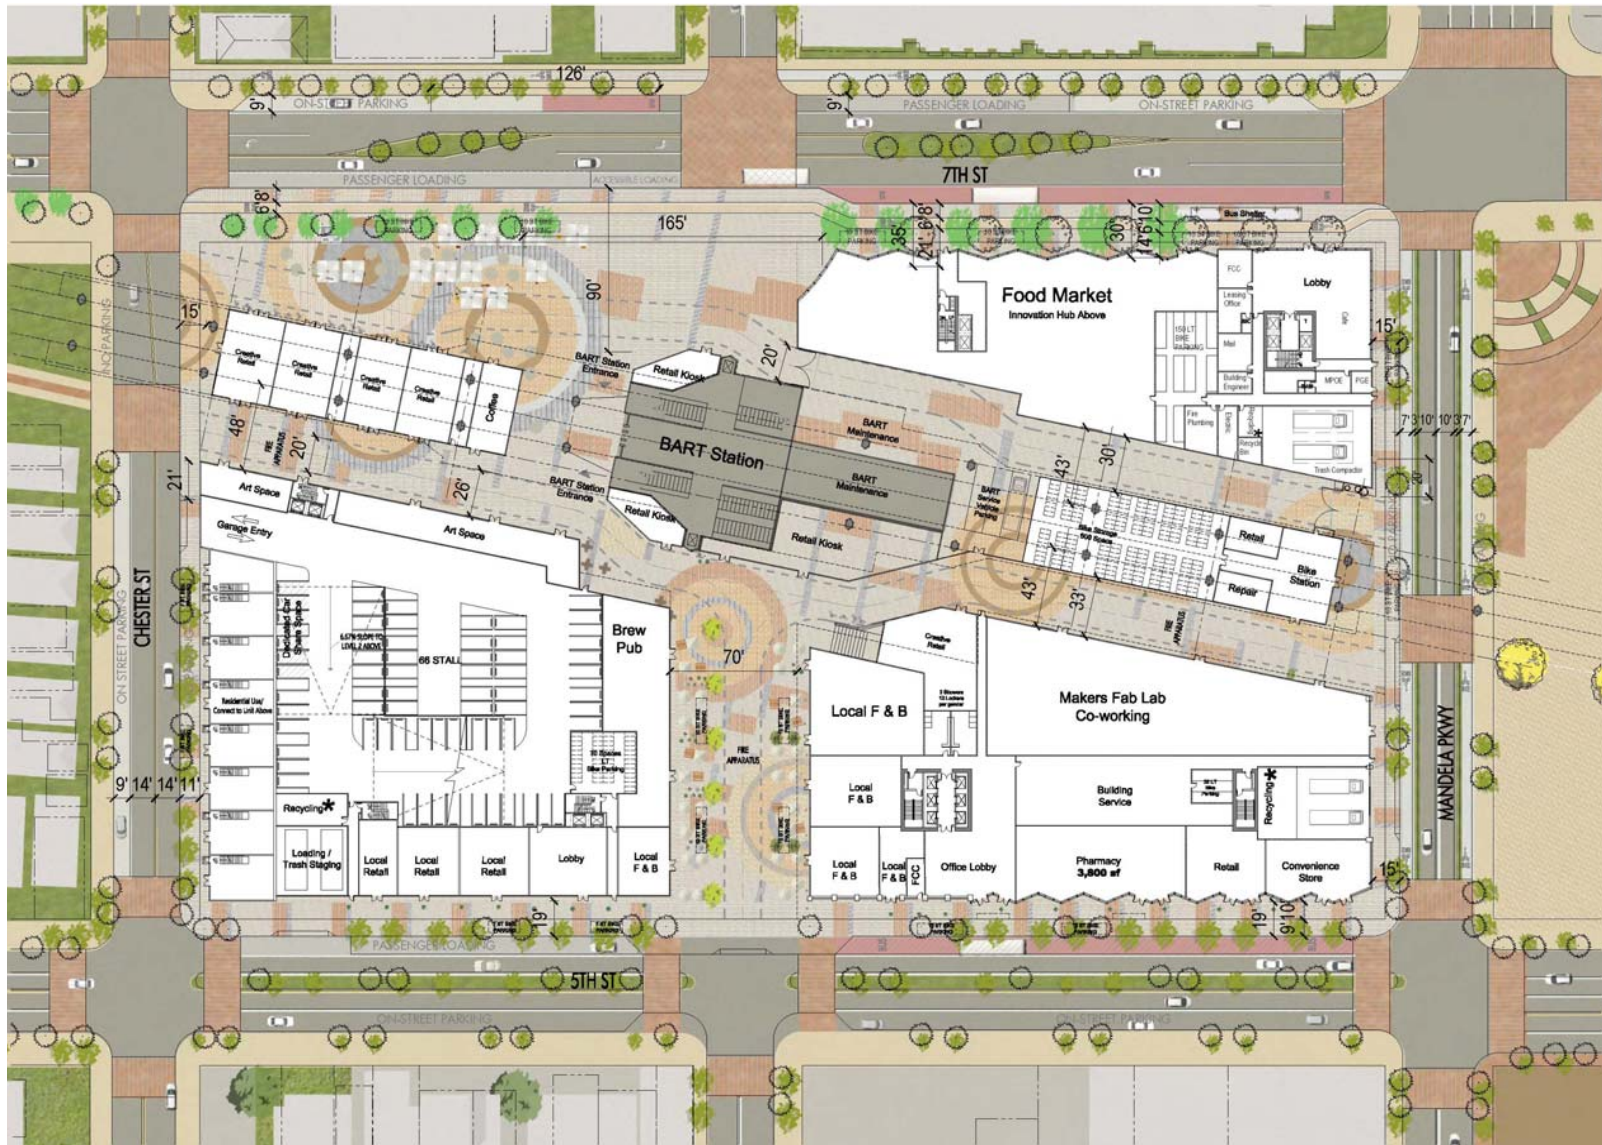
Floor Plan, Ground Floor - 2019 Project (for comparison)
